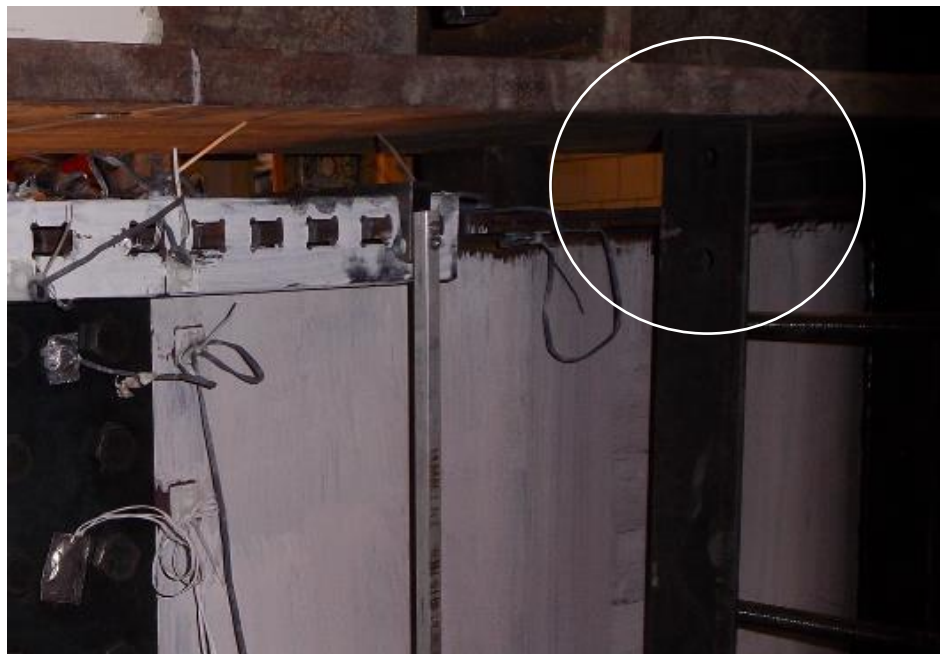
Test 1 load distribution beam loading the bracing
